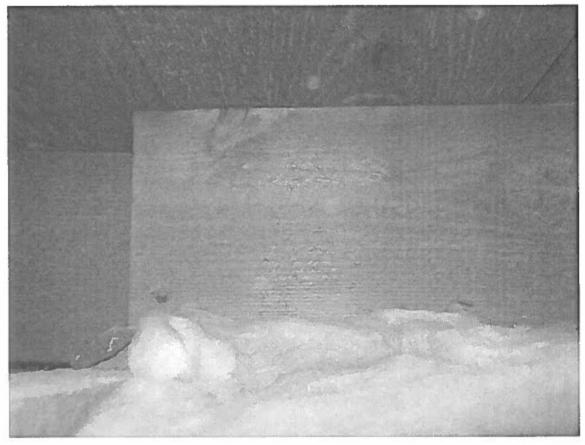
Roof joists and ceiling joists 2 x 8 @ 16"
